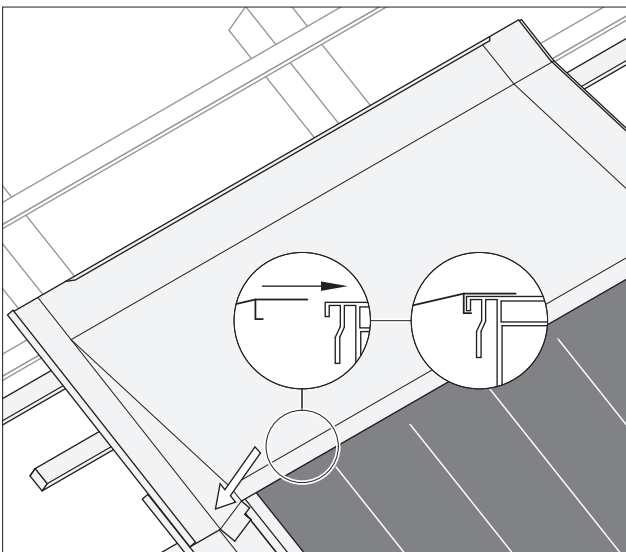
Push upper left flashing sheet into left side panel. The upper locking bar of the flashing sheet must latch into the outer groove of the collector frame (see highlighted details).
